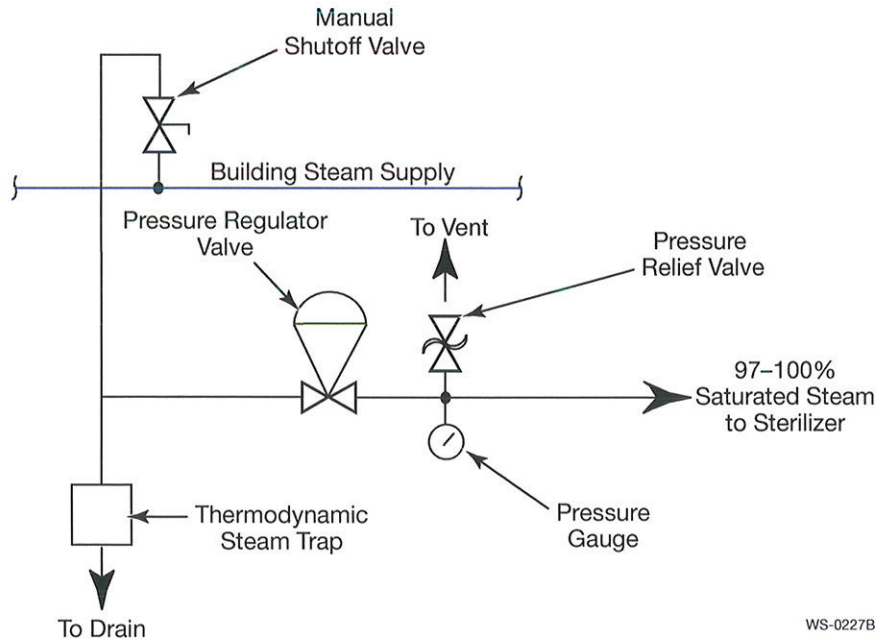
MP-106 STEAM CONDITIONING PACKAGE
